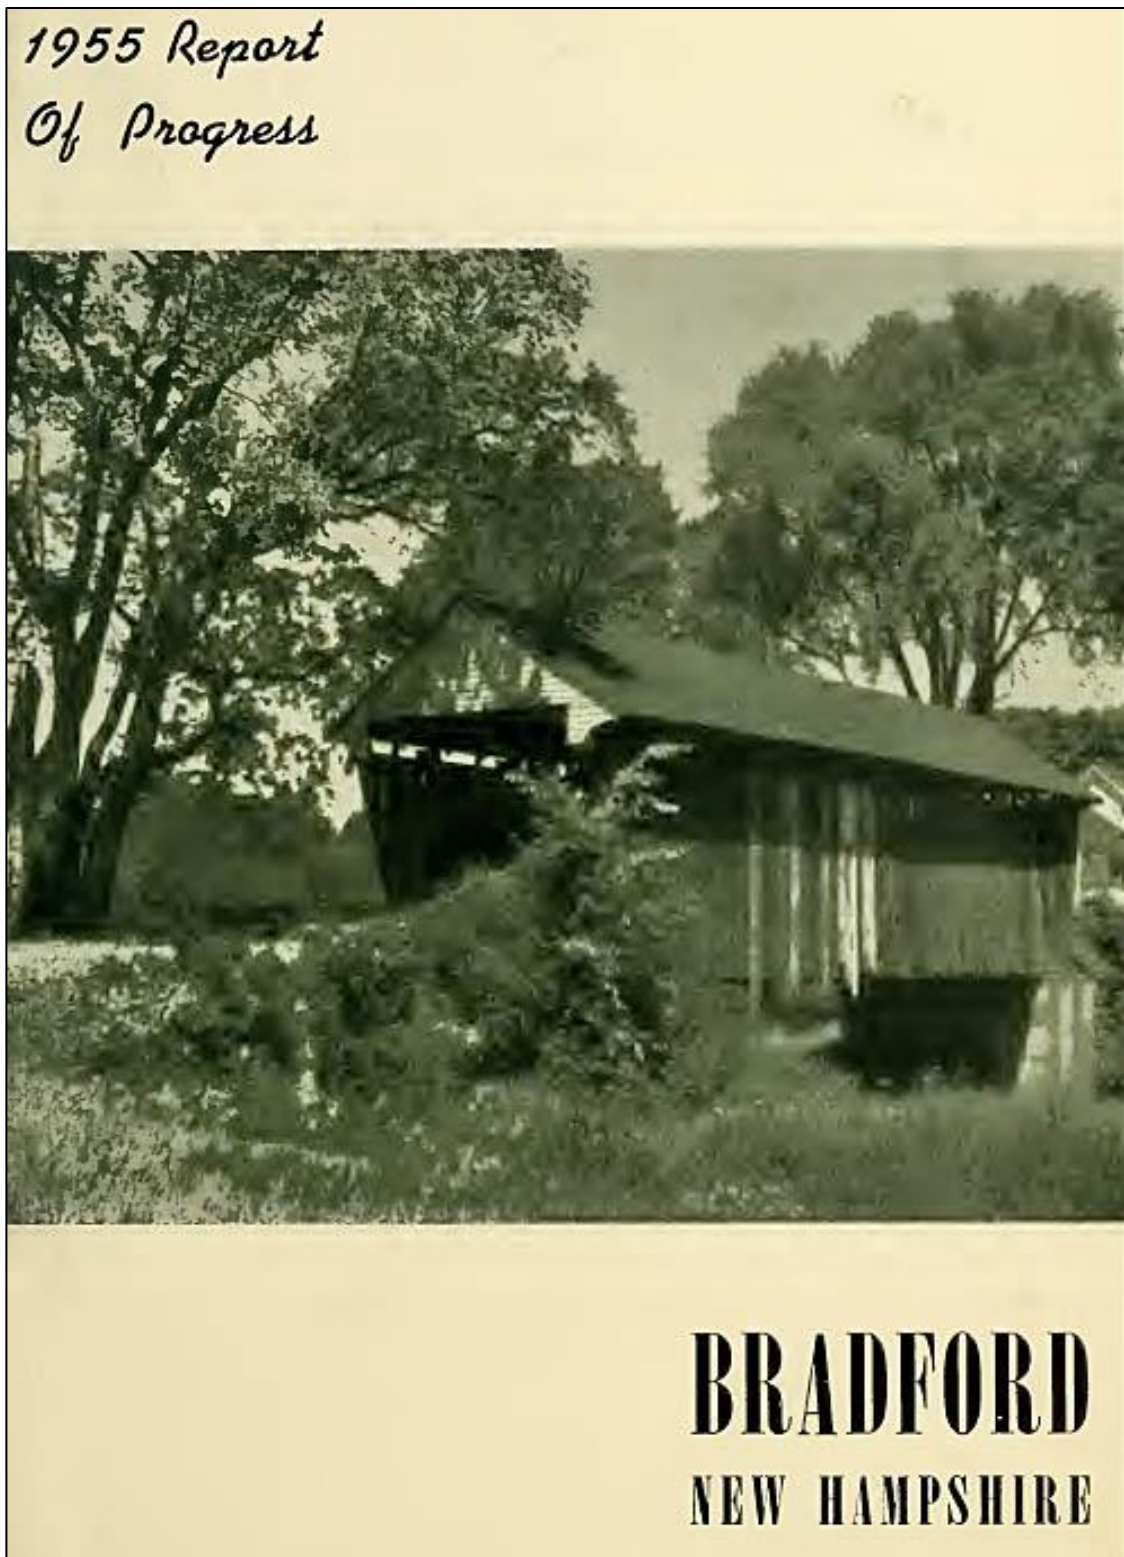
Bement Bridge on cover of Bradford Annual Report for year ending 1955 showing south portal and downstream (east) side. Note prior corrugated metal roofing replaced with asphalt shingles and portal rebuilt with its present squared opening. The work was done by the Town under the general bridge maintenance account in 1954. Photo is credited to Don Sieburg, New Hampshire State Planning & Development Commission.
